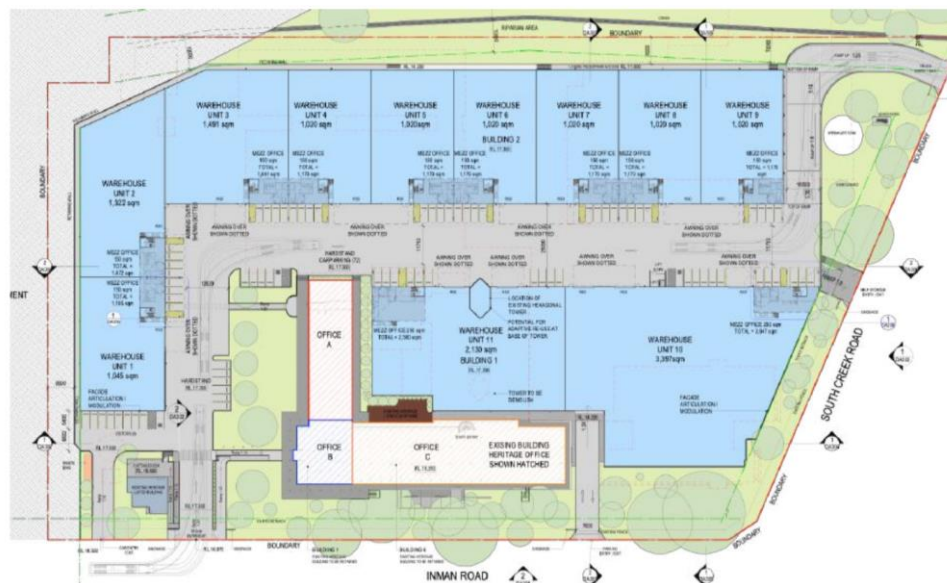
Extract from approved site plan (DA2019/1346), not the modification drawings) showing the location of “Office C” (Courtesy of Concise Planning)
